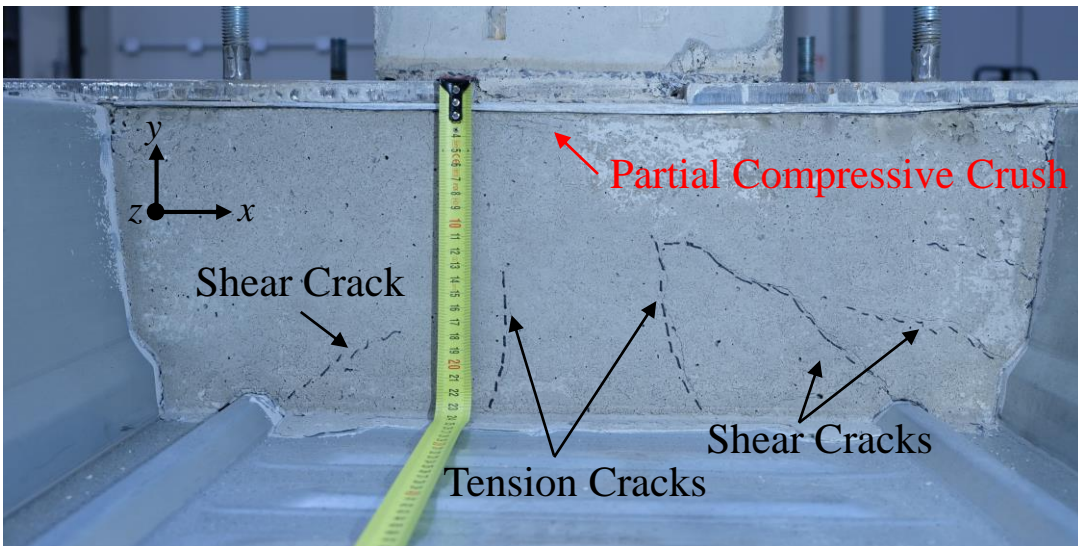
Status of the concrete grout at the mid-span of GJSFB-02 test specimen.
